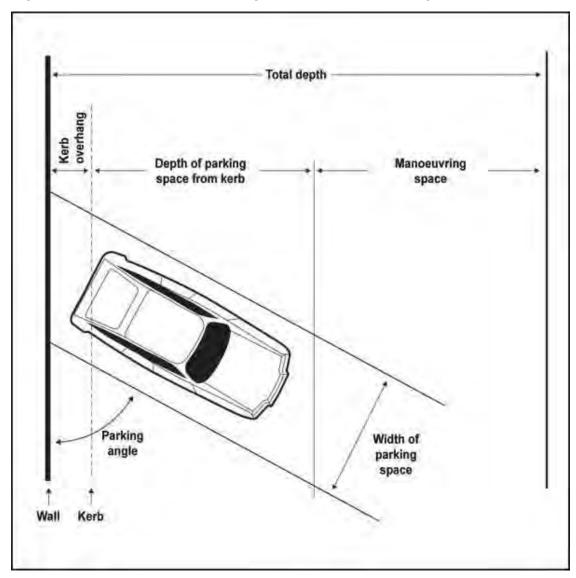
Minimum parking space and manoeuvring dimensions
